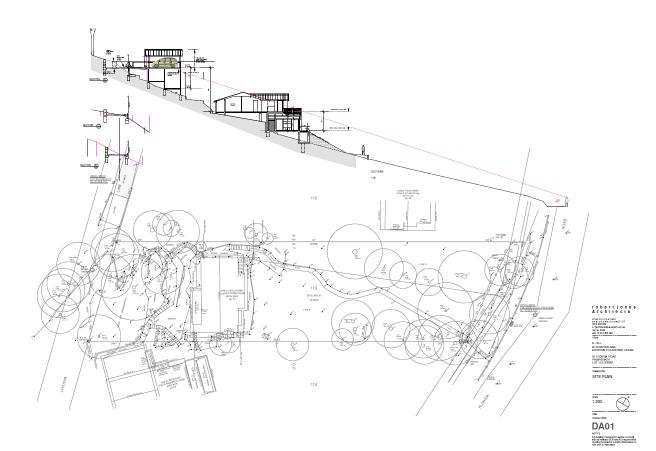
Site Plan Source: Robert Jones Architects, October 2020
